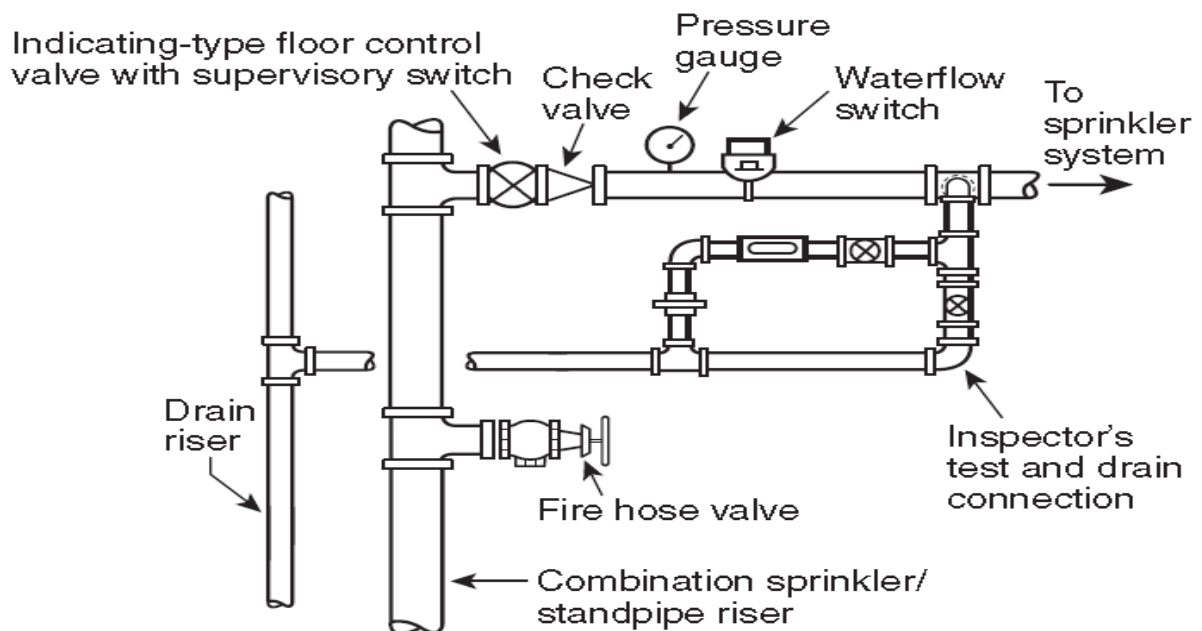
(a) Acceptable Piping Arrangement for Combined Sprinkler/Standpipe System. [14:Figure A.6.3.5(a)]
